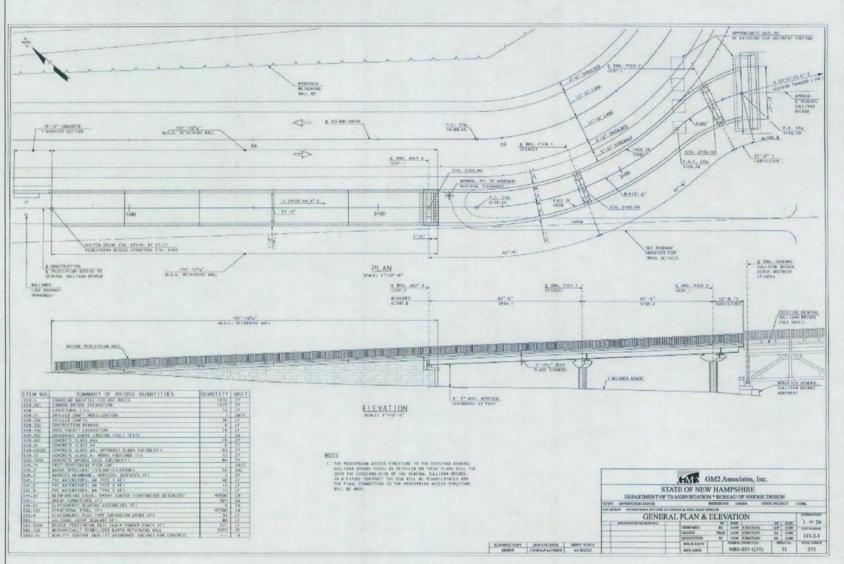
2009 plans for the new north bridge approach and abutment modification, General Plan and Elevation.
